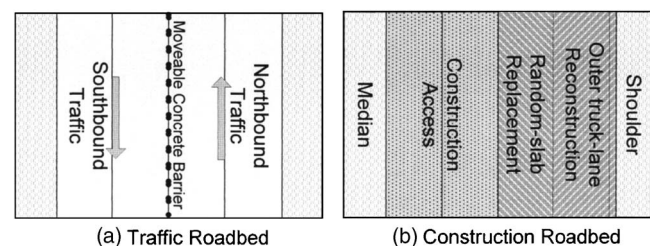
Plan view of construction and traffic roadbeds in segment 1
